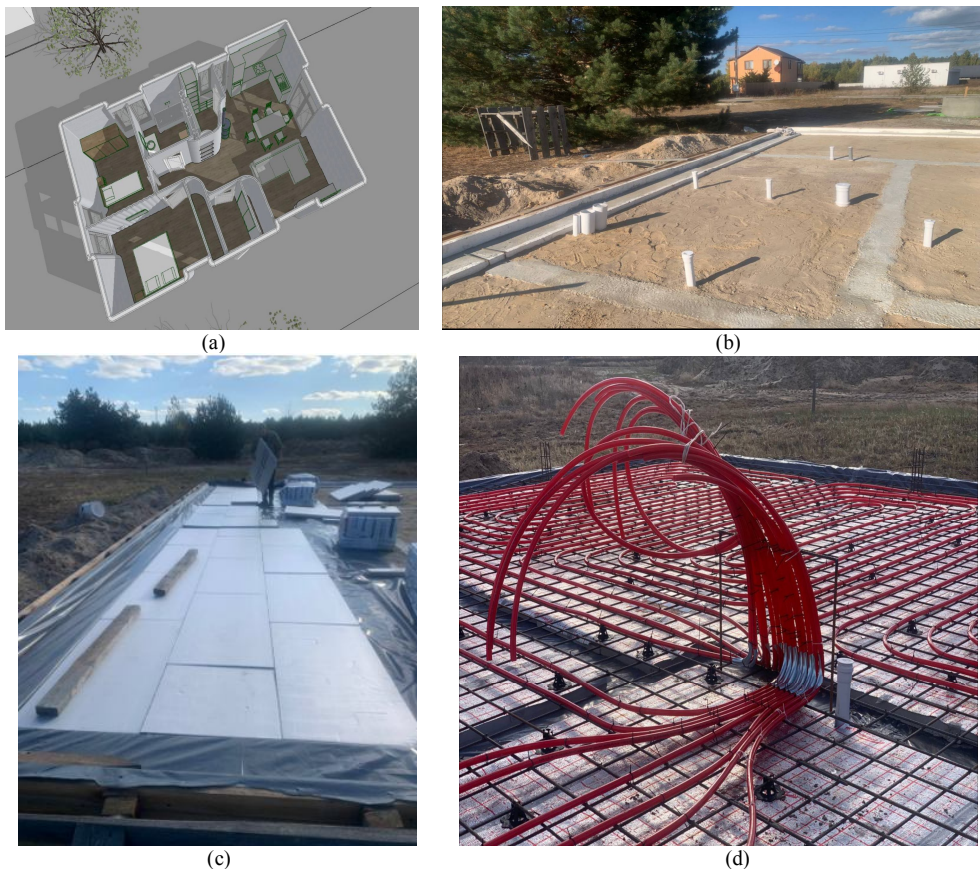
(a) visualization of the interior of the house; (b) – grillage of the completed foundation; (c) – floor insulation; (d) – engineering communications.
